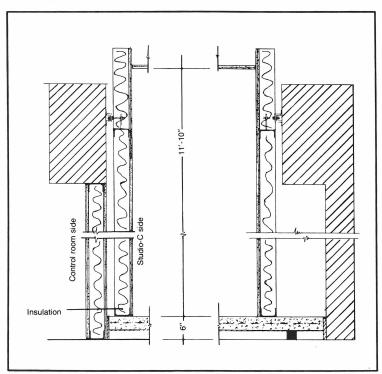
Section B-B of Fig. 11-1 showing wall, ceiling, and floating floor construction of PBA Studio C.
